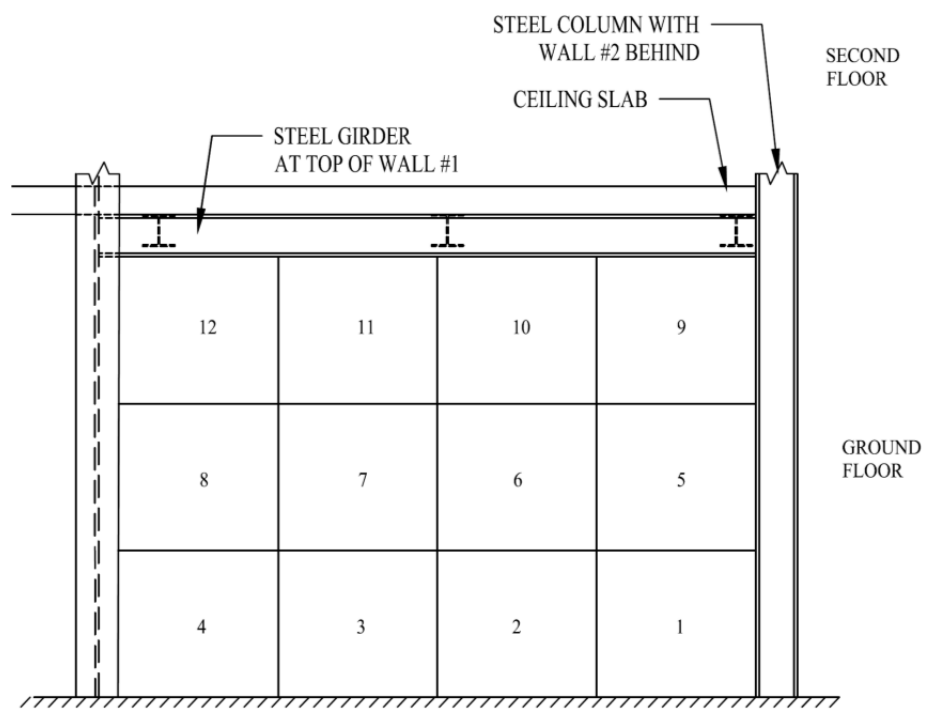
Loading boxes for Wall #1, outside of blast chamber looking in.
